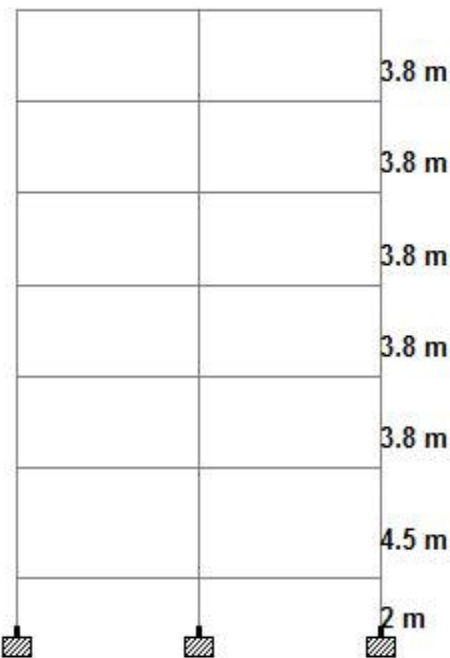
Sectional elevation (A-A) of the 6 storey building.
